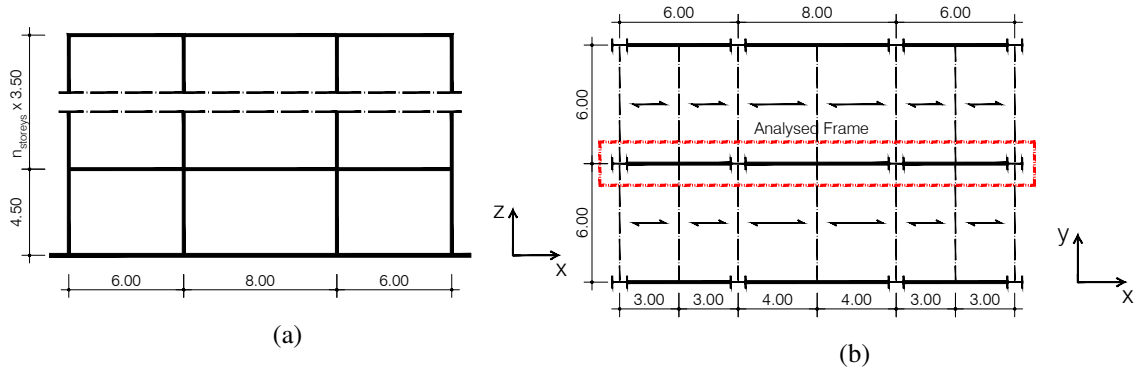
Building configuration 2: (a) Elevation view, (b) Plan view.
